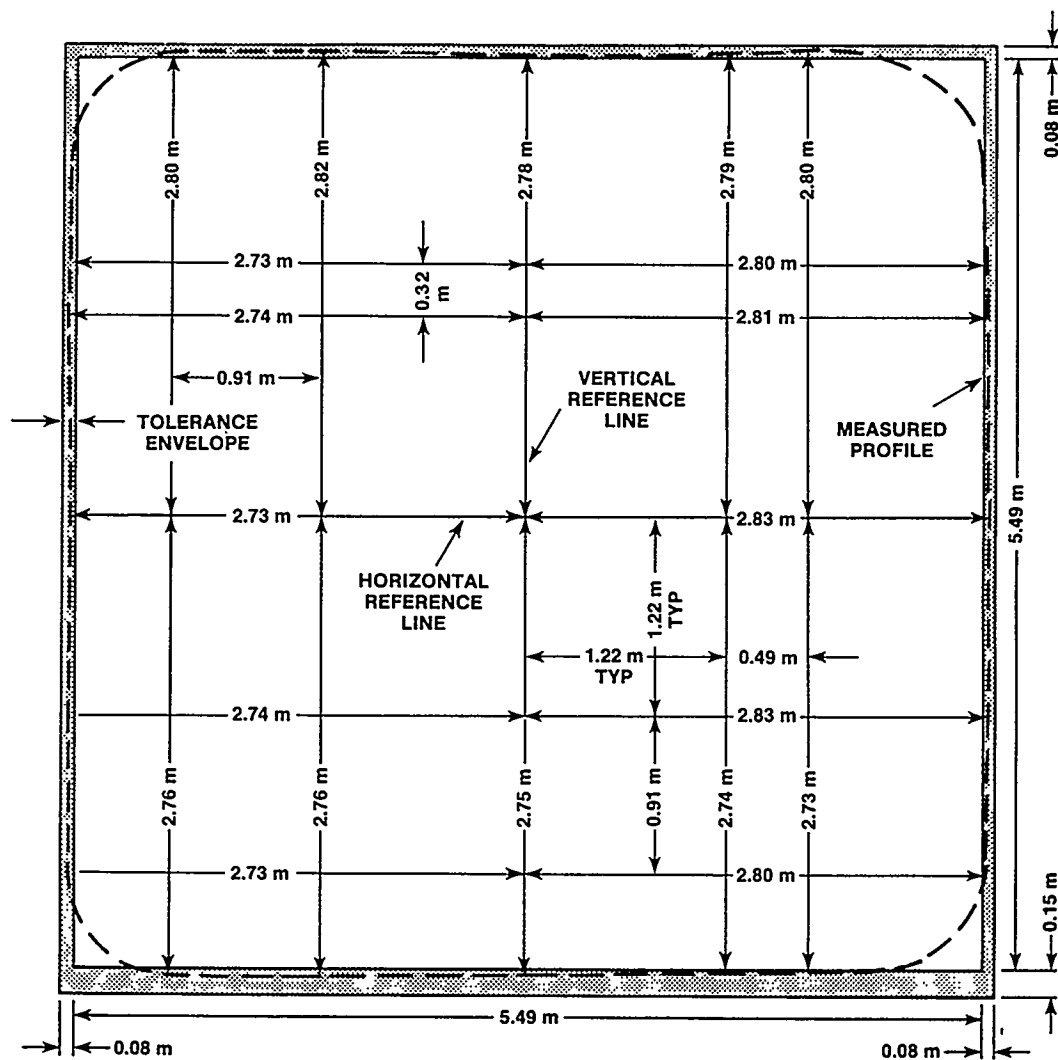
As-Built Cross Section of Station 0.0 m, Room A3
